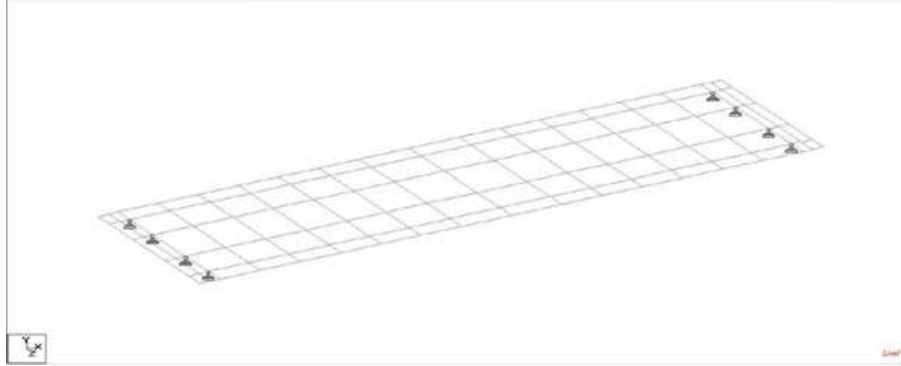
Image of grillage of Slab over PSC-I-girder superstructure in STAAD Pro.
